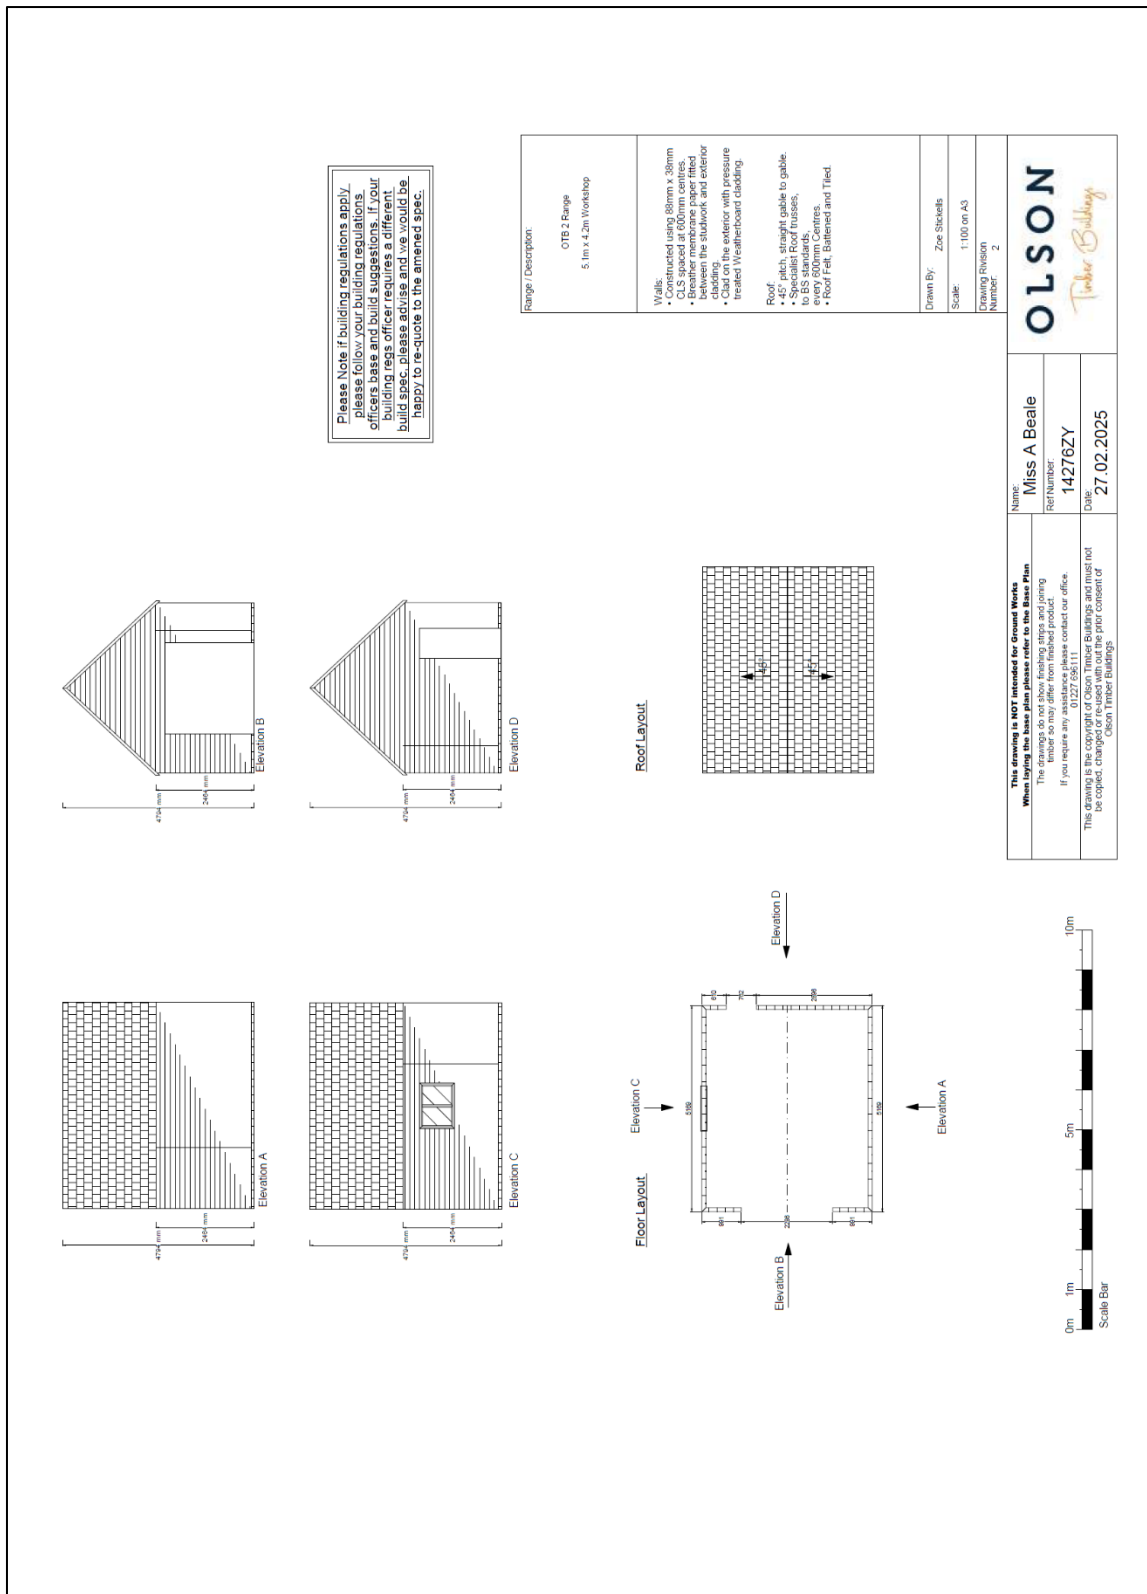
Elevations and plan drawings of proposed construction (Courtesy of Olsen Timber Buildings)
